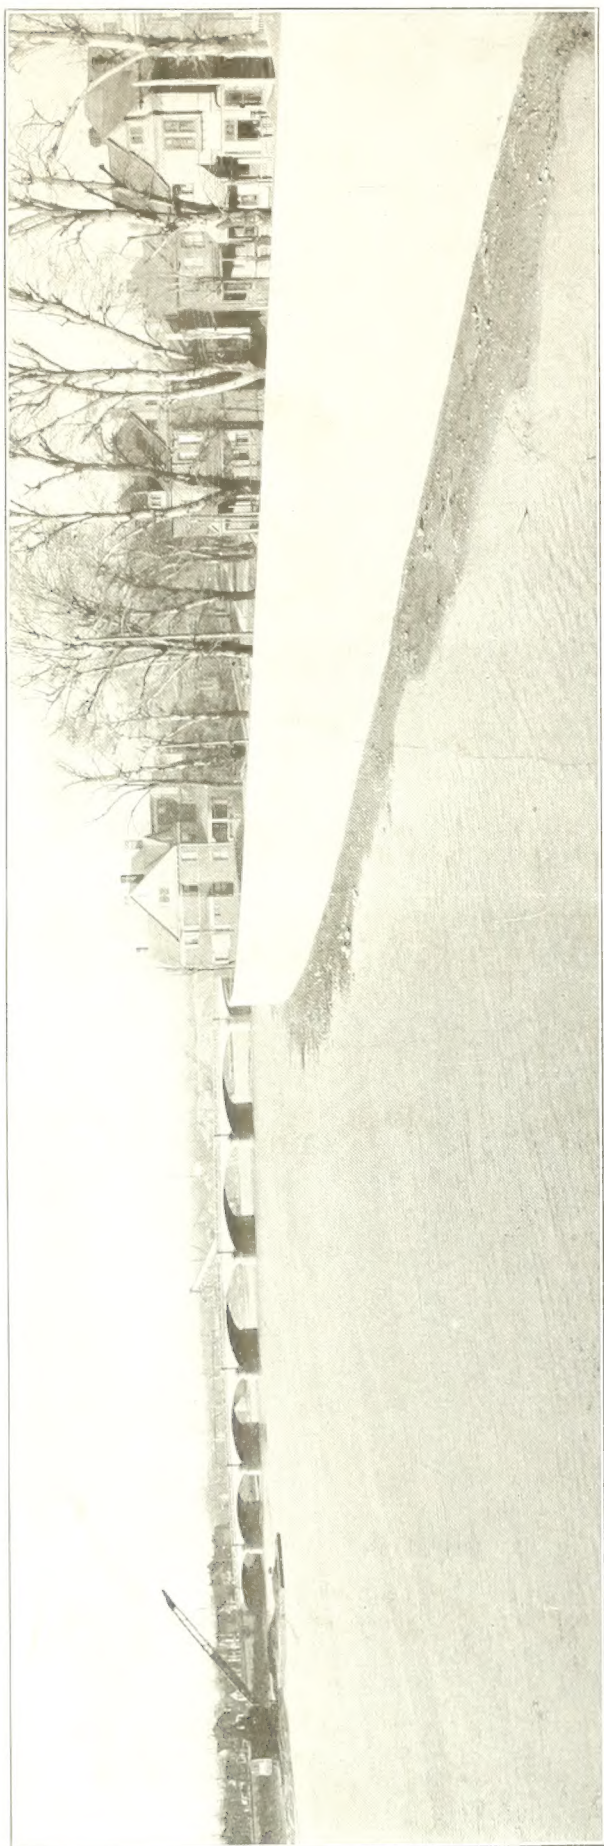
ROBERT BOULEVARD WALL, DAYTON, JANUARY 12, 1921
